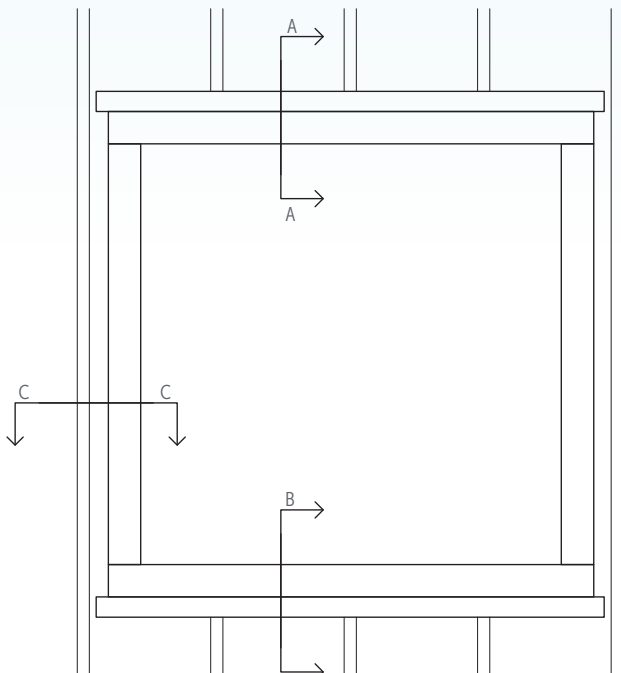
FLASHING AROUND OPENING - VERTICAL FRONT VIEW
